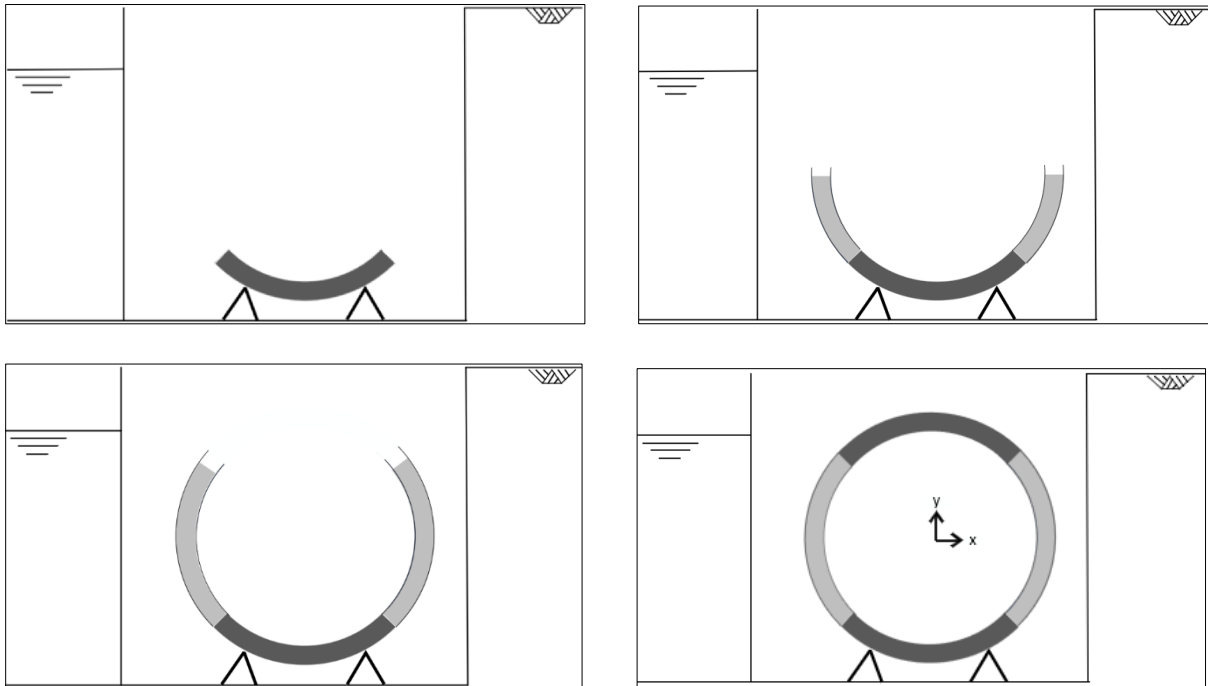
Printing outer and inner shell and casting of concrete (2D view). The bottom and top element can be made with prefab elements (dark grey).
